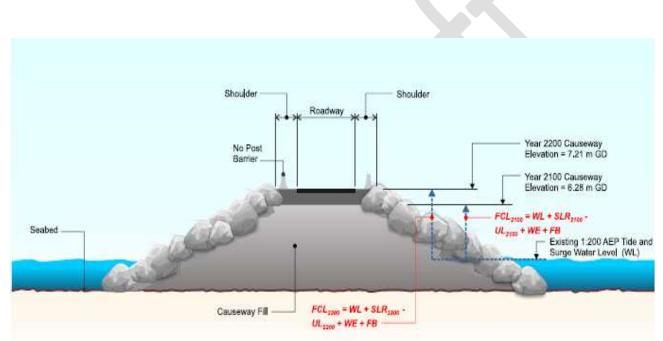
Causeway Cross Section Showing Year 2100 and 2200 Elevations
